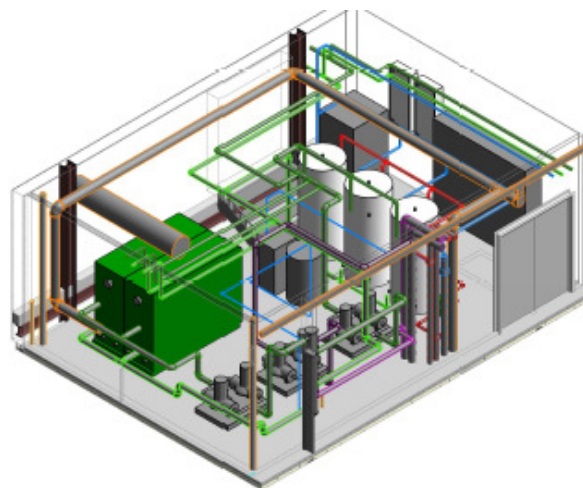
3D Second Floor Plantroom – Turing House School
